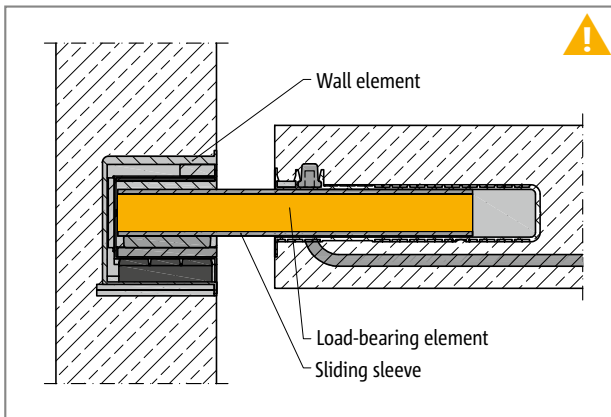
Schöck Tronsole® type Q: Multi-part product (wall component, load-bearing component, sliding sleeve); load-bearing element (yellow) must be installed on the building site.
